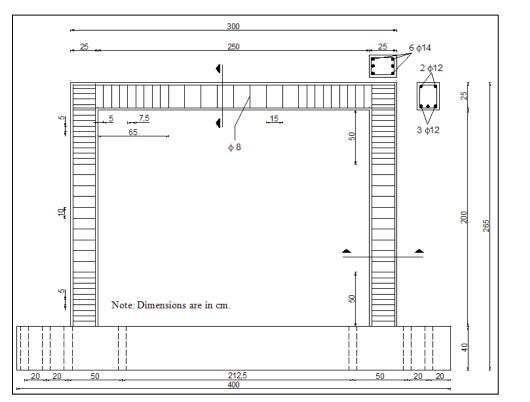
Dimensions and reinforcement details of the RC frame with low strength
